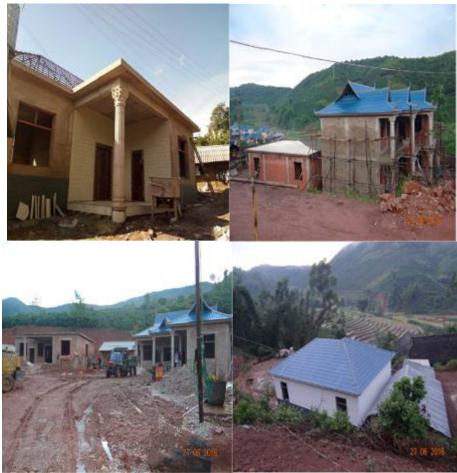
Construction Site of the Resettlement Site for Dongkuo Group of Paliang Village
